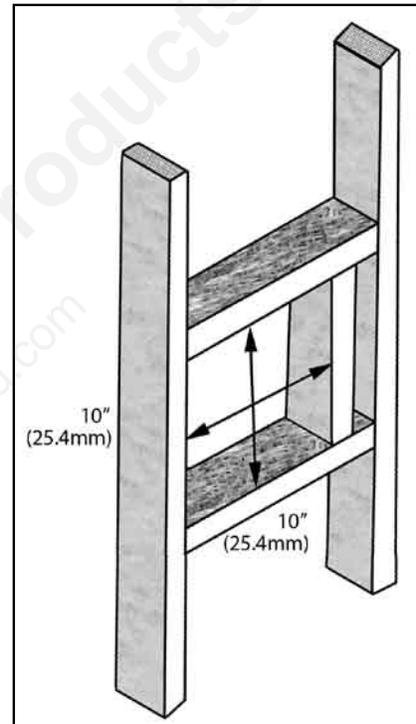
Wall Framing for 10" (25.4 cm) x 10" (25.4 cm) Hole for Horizontal Installation.
